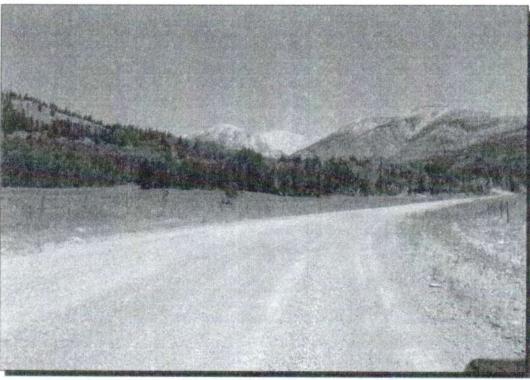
Existing Gravel Road Through Property, Looking Northeast.
